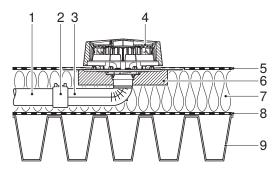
Installation in a lightweight roof insulated, horizontal outlet in the thermal insulation with roof foil and vapour barrier
